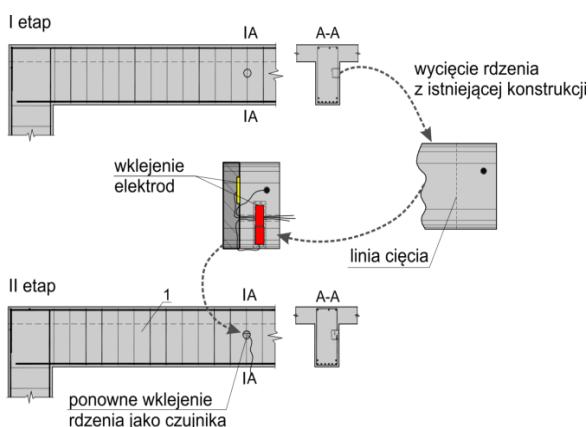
Sensor for monitoring the corrosion risk of reinforcement in concrete structures.
